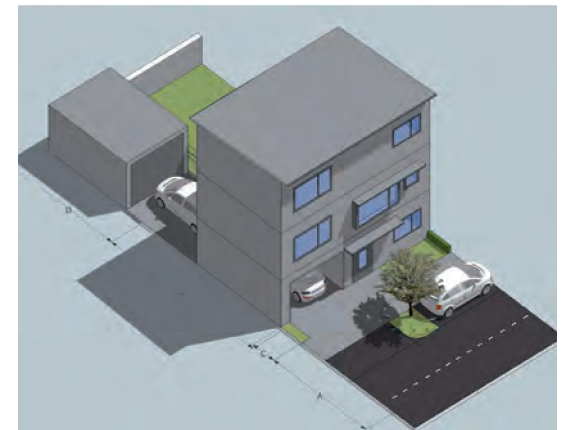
Indicative Parking layout for garage and on plot parking in front layout.
